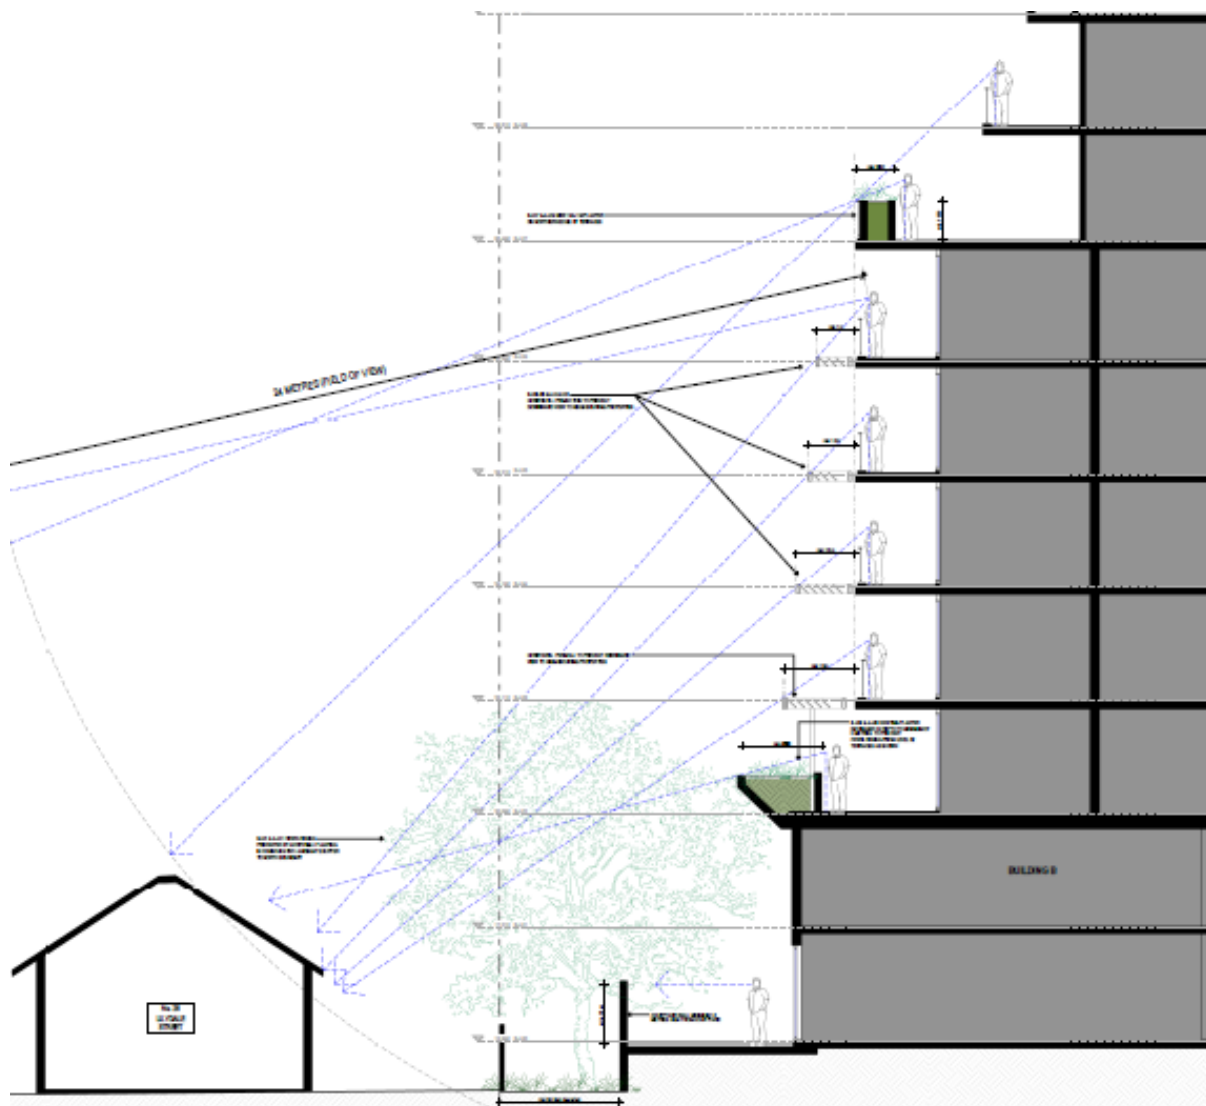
Extract from “Building B Context Section with Lilydale Street neighbours” drawing DA-R30
